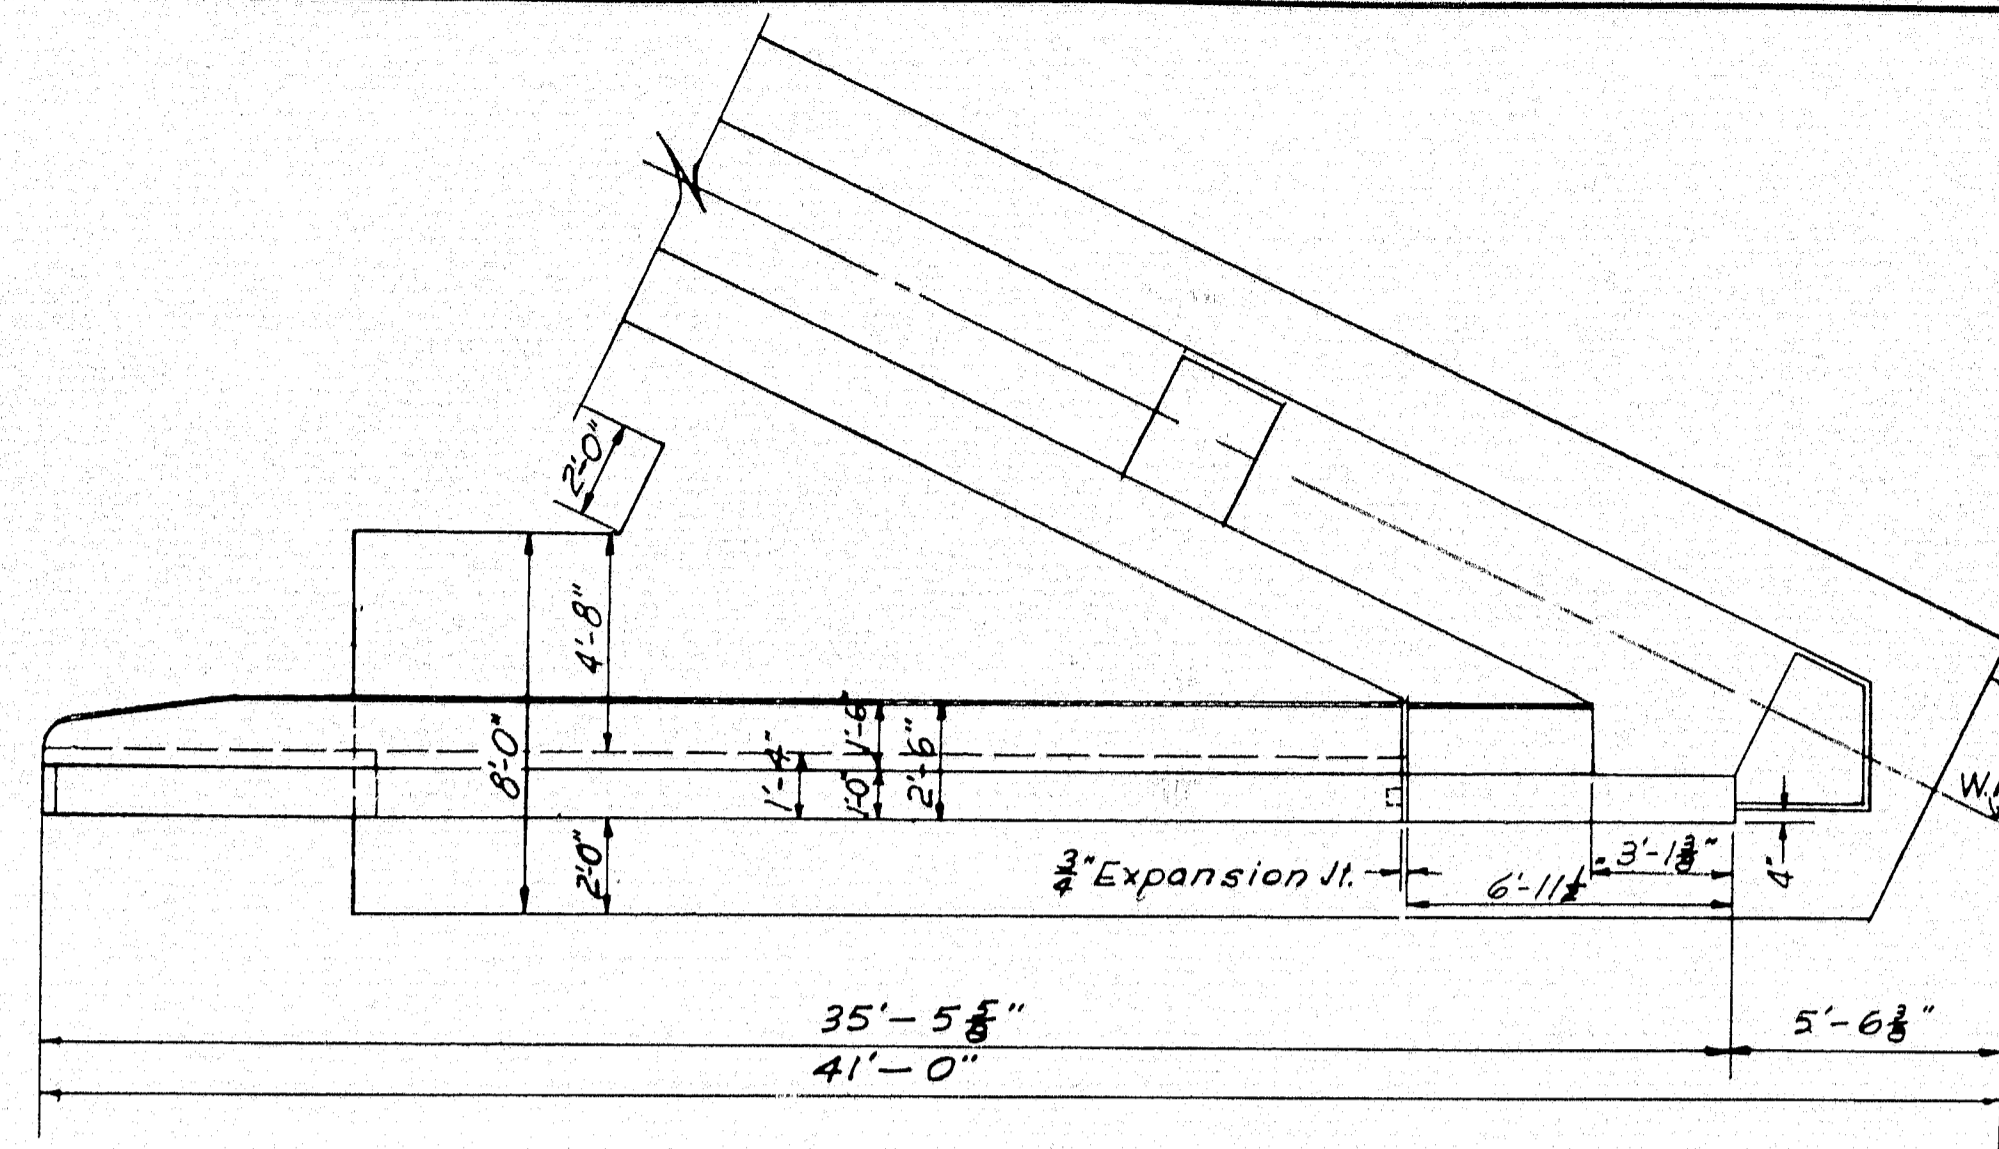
PLATE J - PLAN-PROFILE OF P. R. R. E. STANDARD
